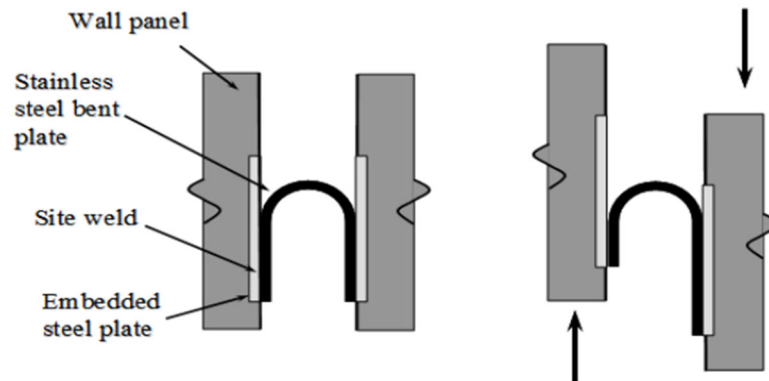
Installation and Working Mechanism of U-Shaped Flexural Plates ([Iqbal et. al. 2010](#))
